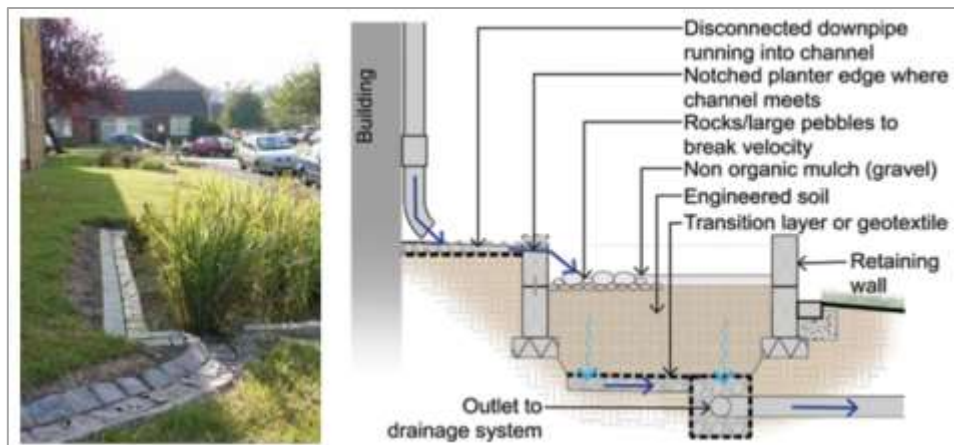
Small domestic rain garden and cross section through bioretention planter from disconnected downpipe¹⁷³
